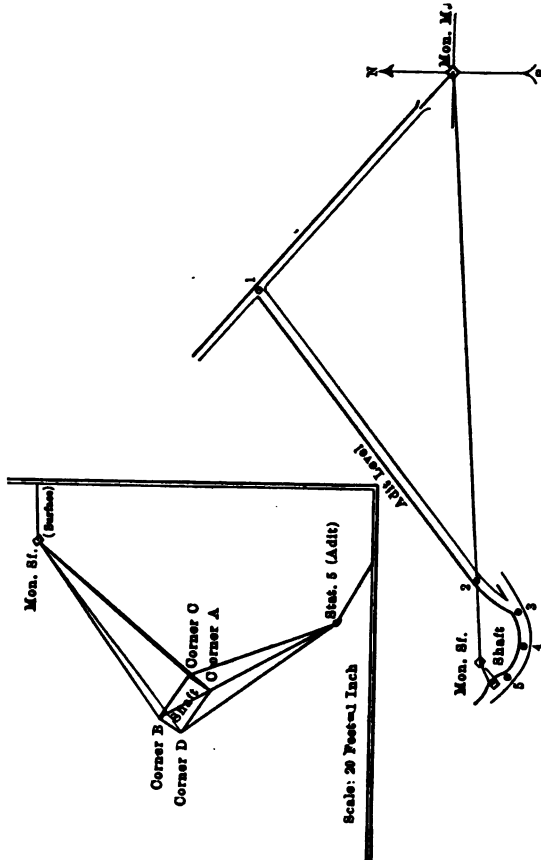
HORIZONTAL PLAN OF SHAFTS AND ADIT.
